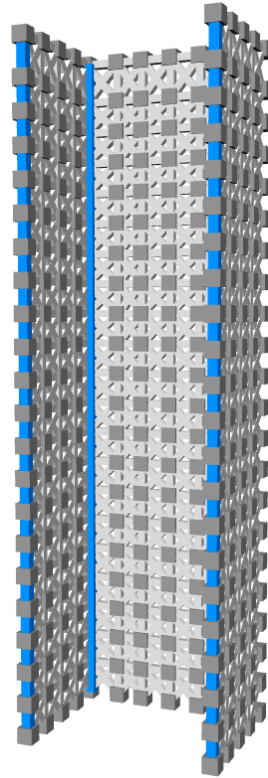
Perspective view of the beam-truss model for TUF when loaded in the South-North direction.
